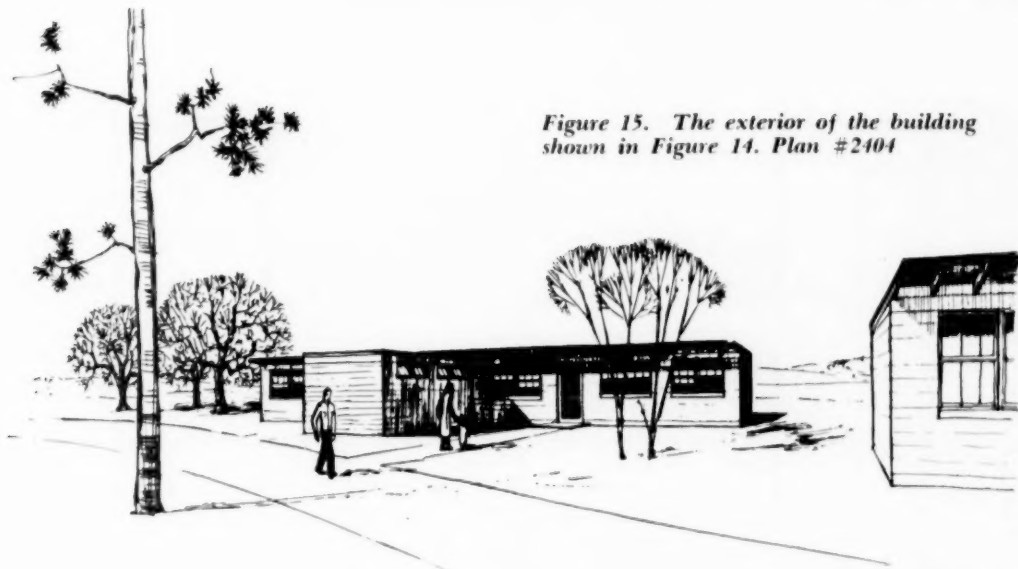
The exterior of the building shown in Figure 14. Plan #2404
